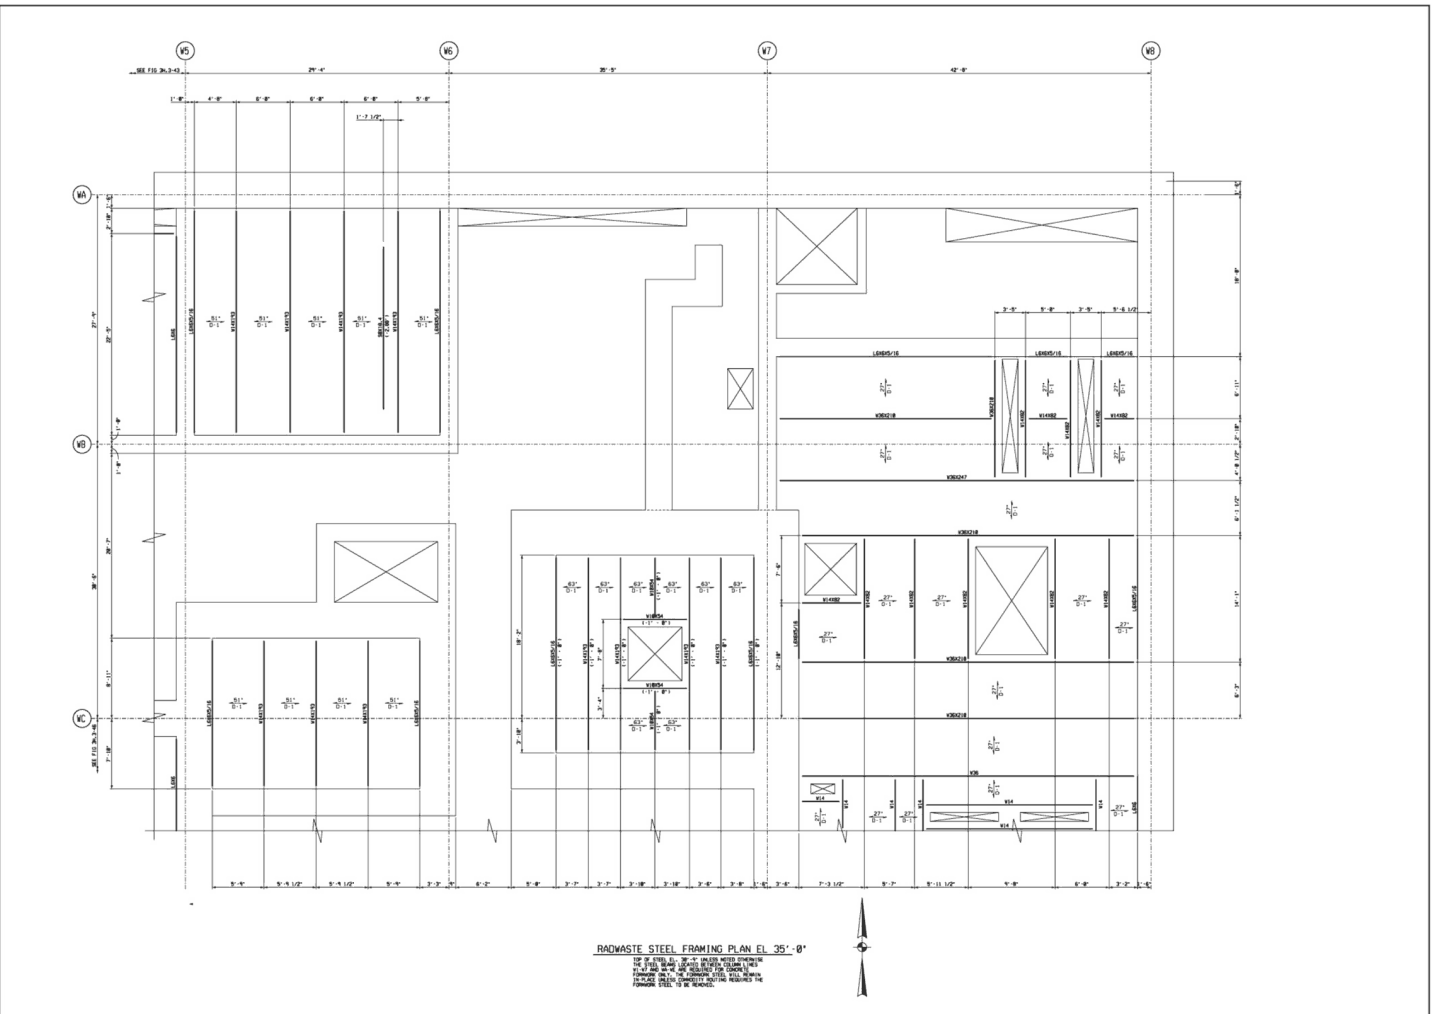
H.3-44 El 35'-0" Steel Layout Between Column Lines W5-W8 and WA-WC
